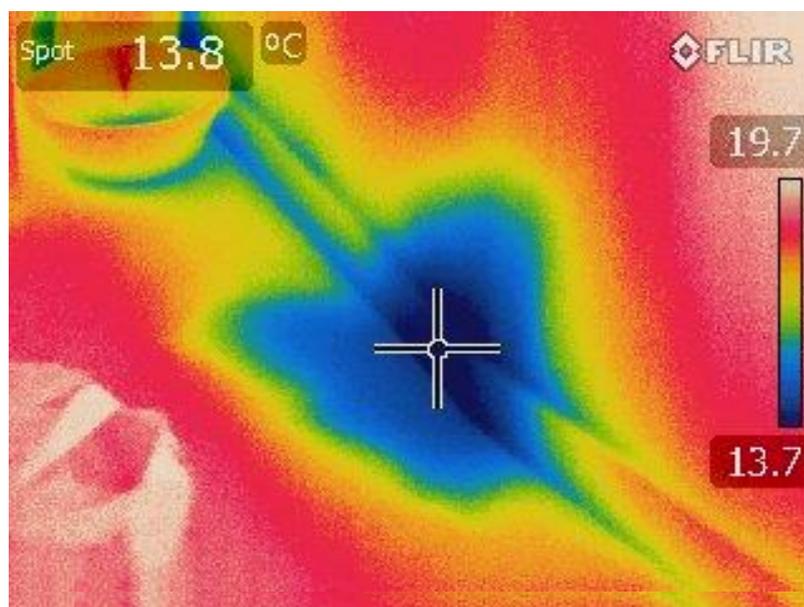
First Floor Bedroom above Kitchen Phase 1 Heat Loss
